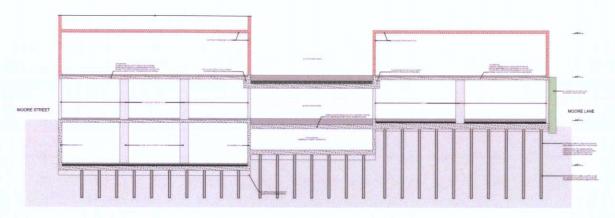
Section Through Site 4 Showing Basement Foundation Strategy and Basement Levels.
